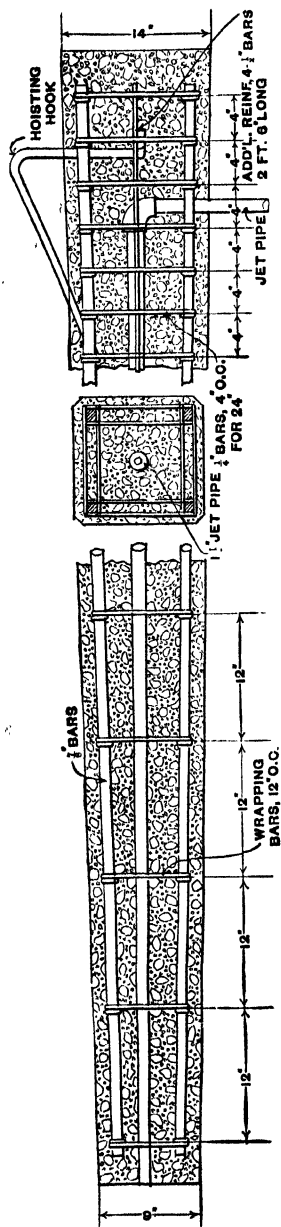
Piles used at Cambridge, Mass. (See p. 687.)
